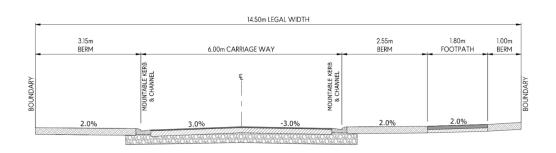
Typical Cross-Section (H) Local Road - 14.5m With Berm
